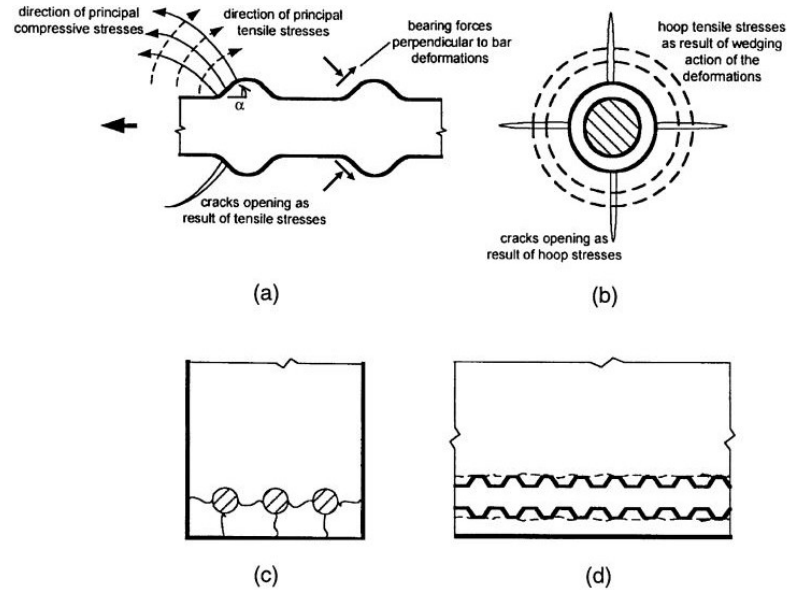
Cracking and Damage Mechanism in Bond; (a) side view of a deformed bar with deformation face angle showing formation of Goto Cracks, (b) end view showing formation of splitting cracks parallel to the bar, (c) end view of the member showing splitting cracks between bars and through the concrete cover; and (d) Side view of the member showing shear crack and local concrete crushing due to bar pullout [7]
